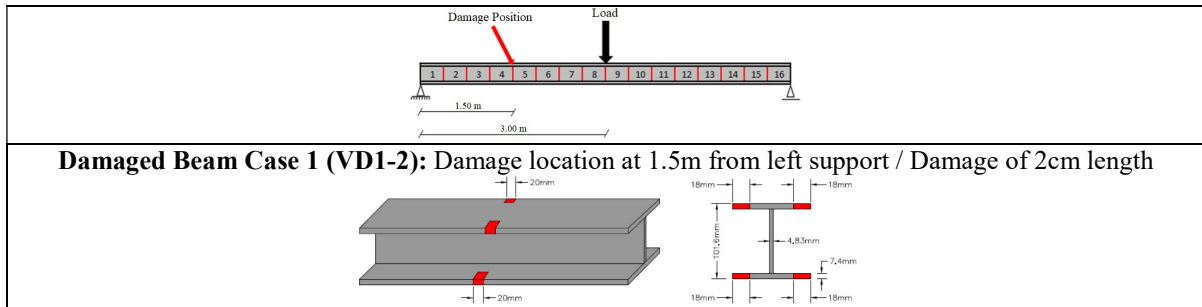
Damaged steel beam: Case 1 VD1-2 (Silva, 2015 [6])
